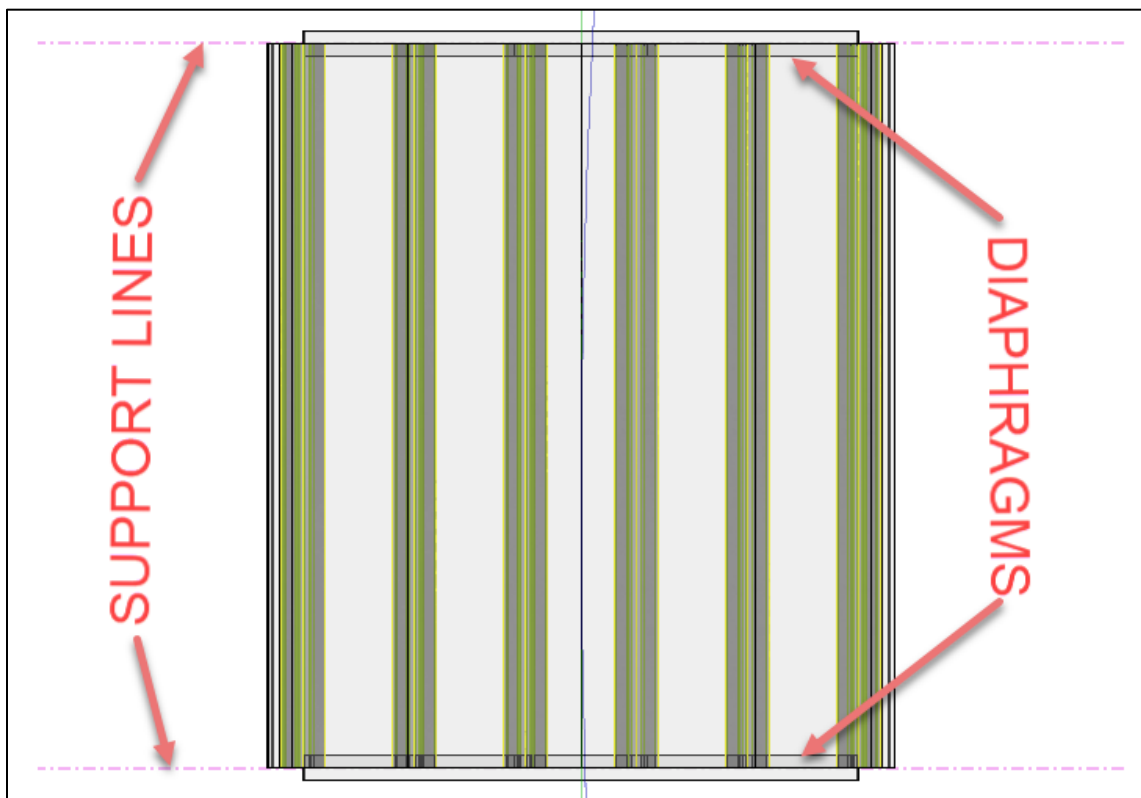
Plan View - Diaphragm Thickness Centered on SupportLines
